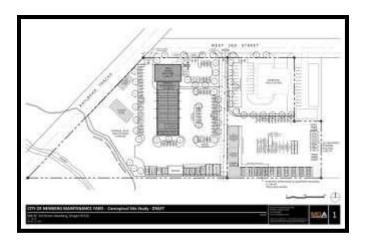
CONCEPTUAL PUBIC WORKS MAINTENANCE YARD PLAN
